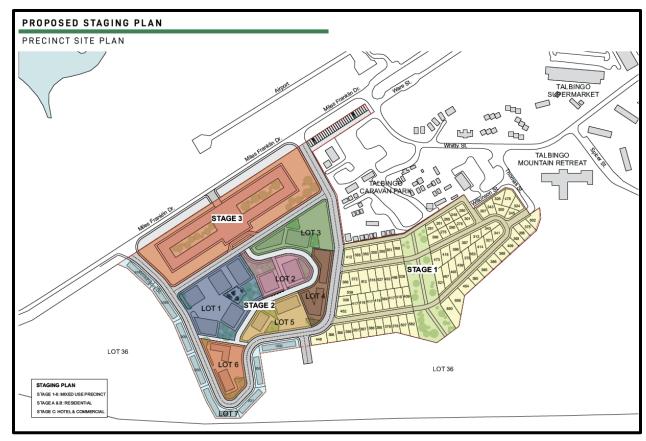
Staged Precinct Masterplan (Source: West Talbingo Village Masterplan – Robert Harwood Architects)
